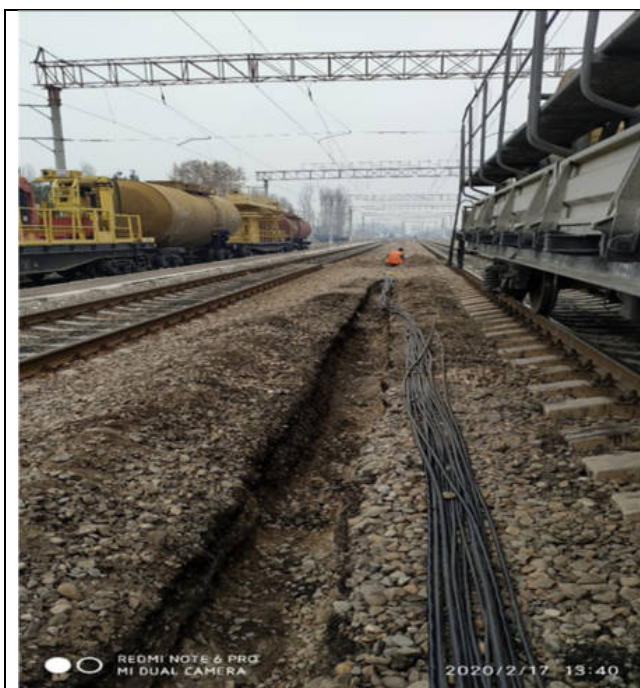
Digging of trenches for Signalling and Communication cables at the station Chust.
